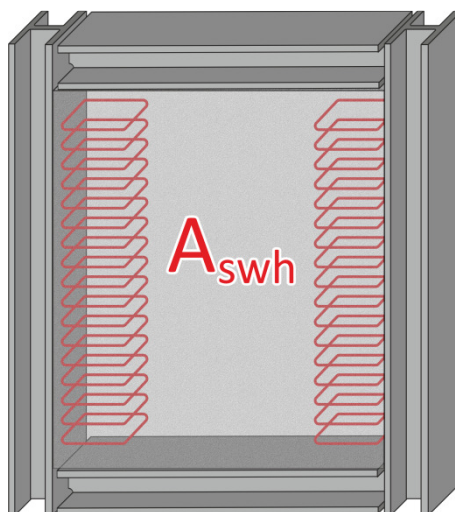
CONFINING REINFORCEMENT OF THE BOUNDARY ZONES OF THE WALL
